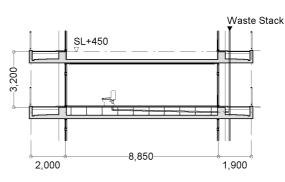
Cross-section of a Dwelling Unit with the Inverted Slab / Beam Structure
